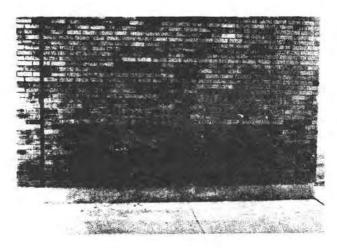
Case IV. South wall of a 2-story building with one brick removed.
